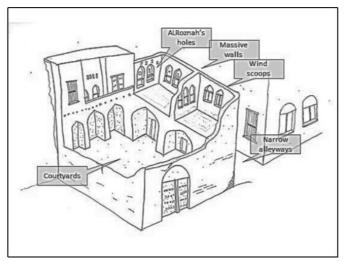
A section shows the wall thickness and Al-Roznah in an old Omani house (Source: Author, 2023)
